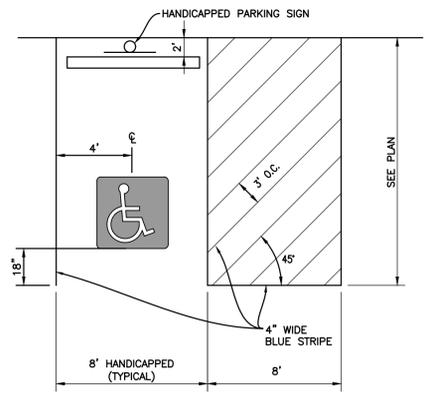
ACCESSIBLE PARKING SIGNAGE
